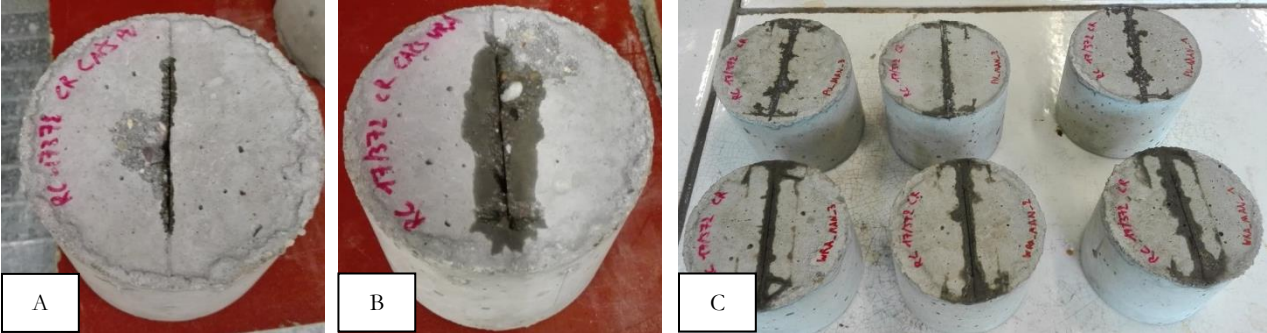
DIFFERENT HEALING MECHANISMS APPLIED ON THE CONCRETE CYLINDERS; (A) CAPSULE BREAKAGE (PU), (B) CAPSULE BREAKAGE (WRA), (C) CRACK INJECTION (PU & WRA)
